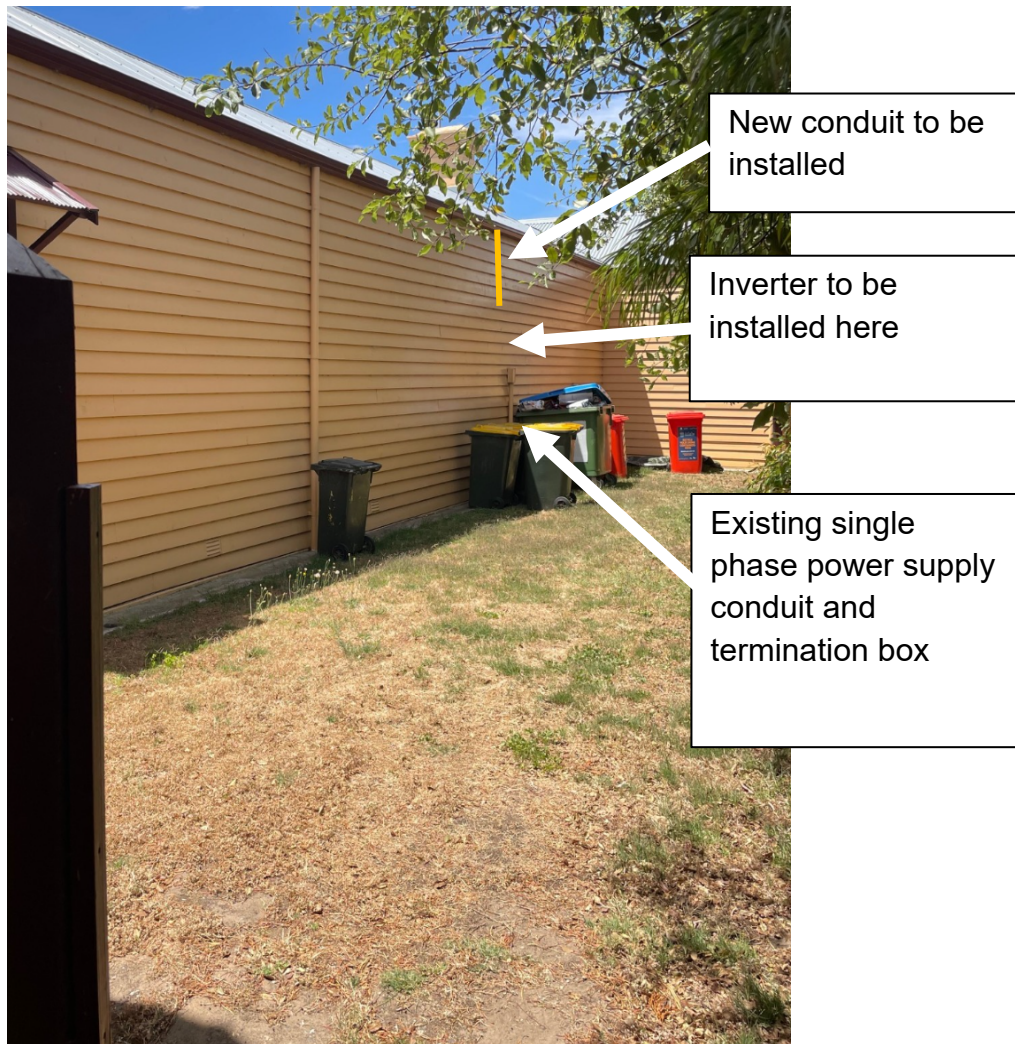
South wall of Station building and service courtyard. This courtyard area is surrounded by the station building and 1800mm timber fence. It is not accessible nor seen by the public.
